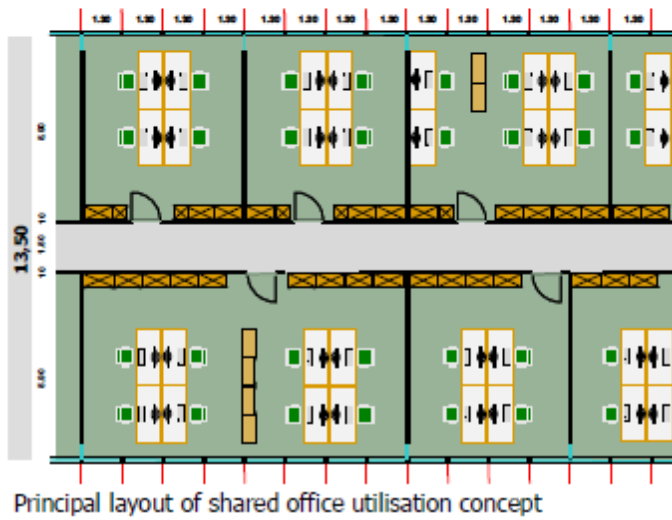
Principles of designing office space (Source: Erste campus design competition)
